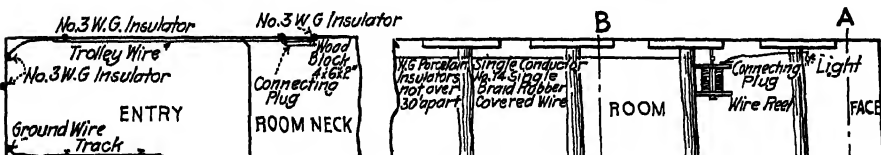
STANDARD POWER AND LIGHTING CONNECTION IN ROOM.
